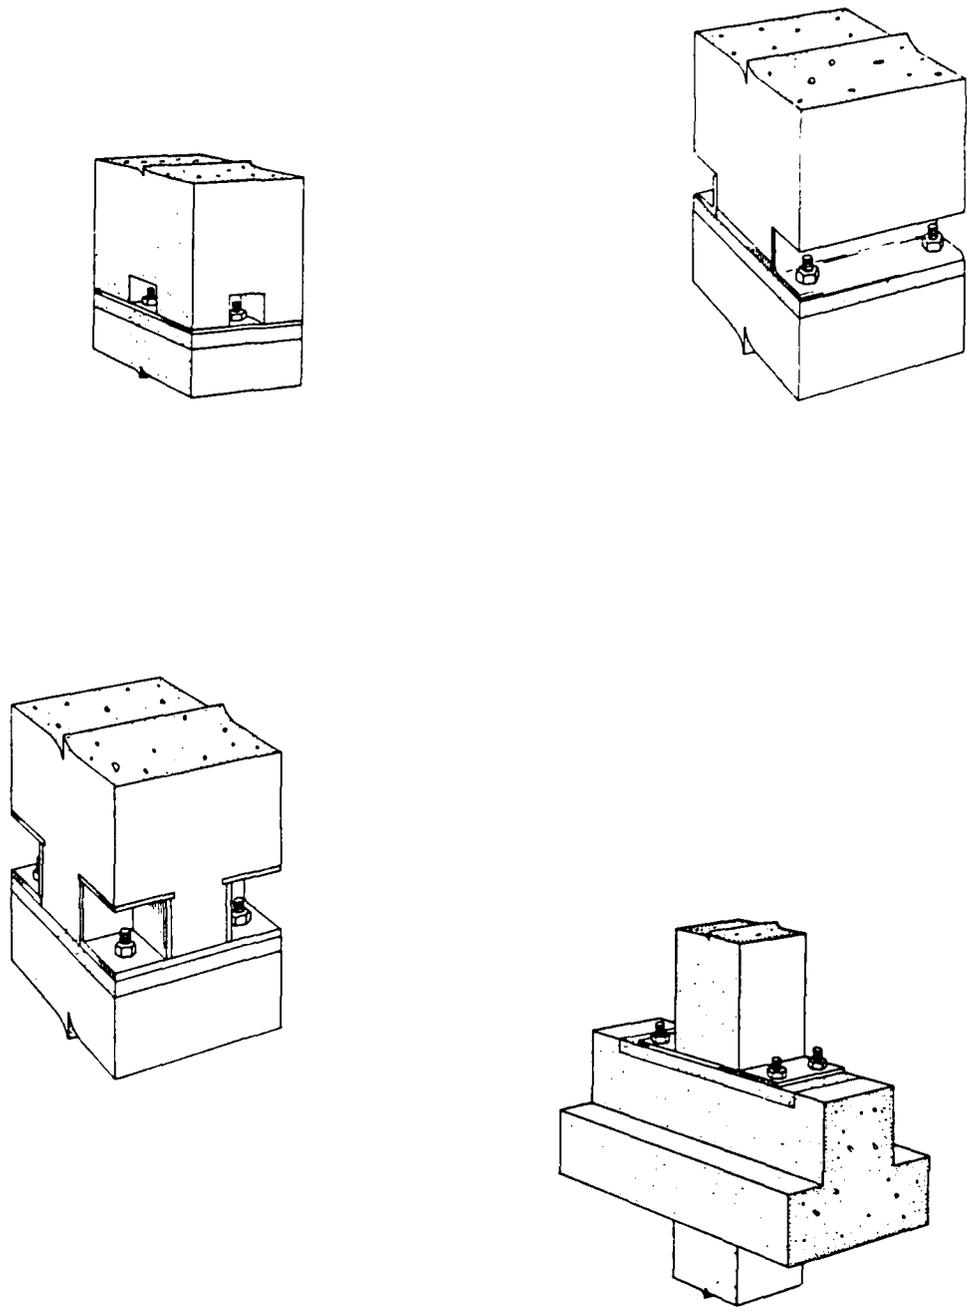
Precast Column-to-Column Connections. (Ref. 21)
